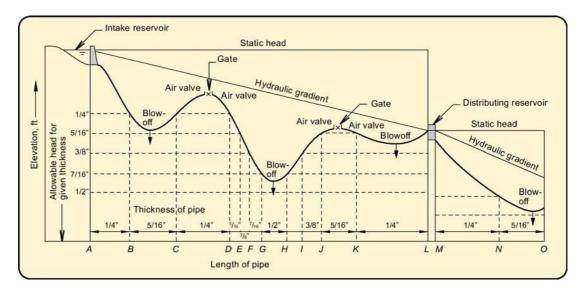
Hydraulic profile (Source: USQ Public Health Engineering Study Book)
